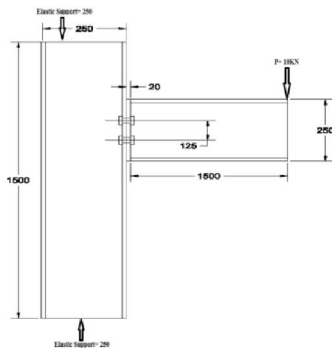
Beam-Column bolted Structural steel connection. (Dimensions are in mm)
